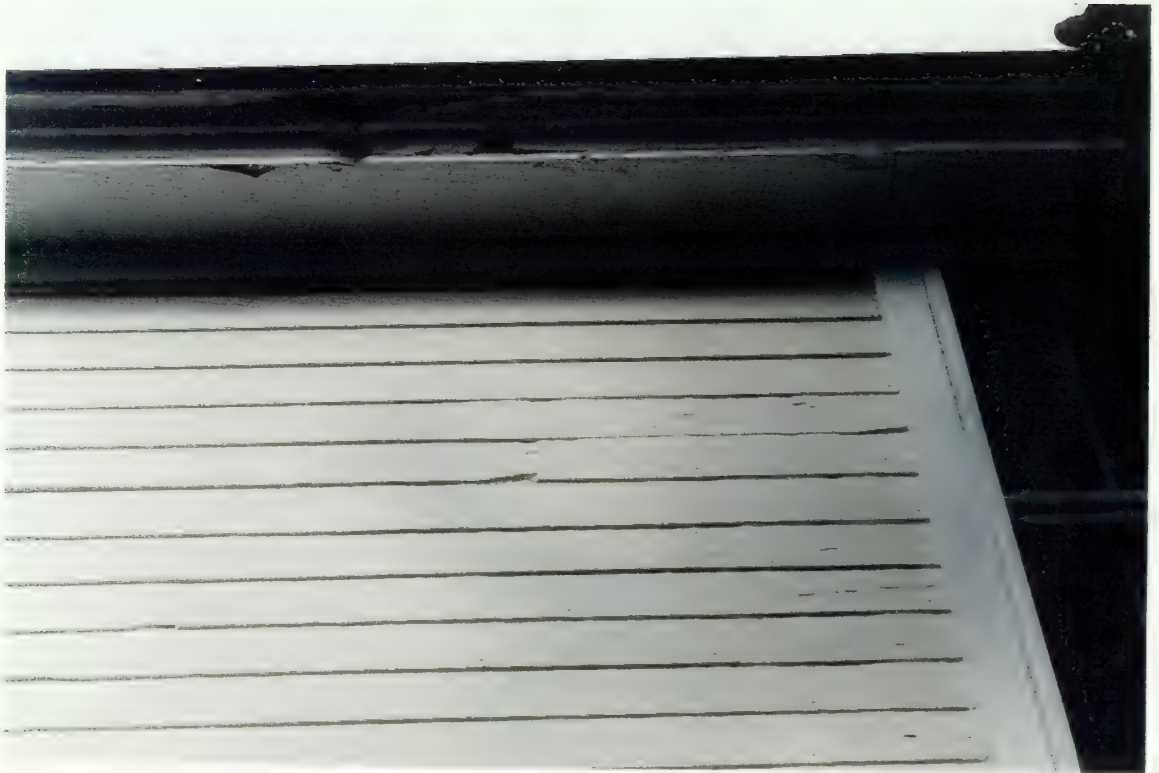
Section of the soffit on the southeast elevation of the house showing where water penetration from gutter leaks has caused a section of the soffit to rot through.
